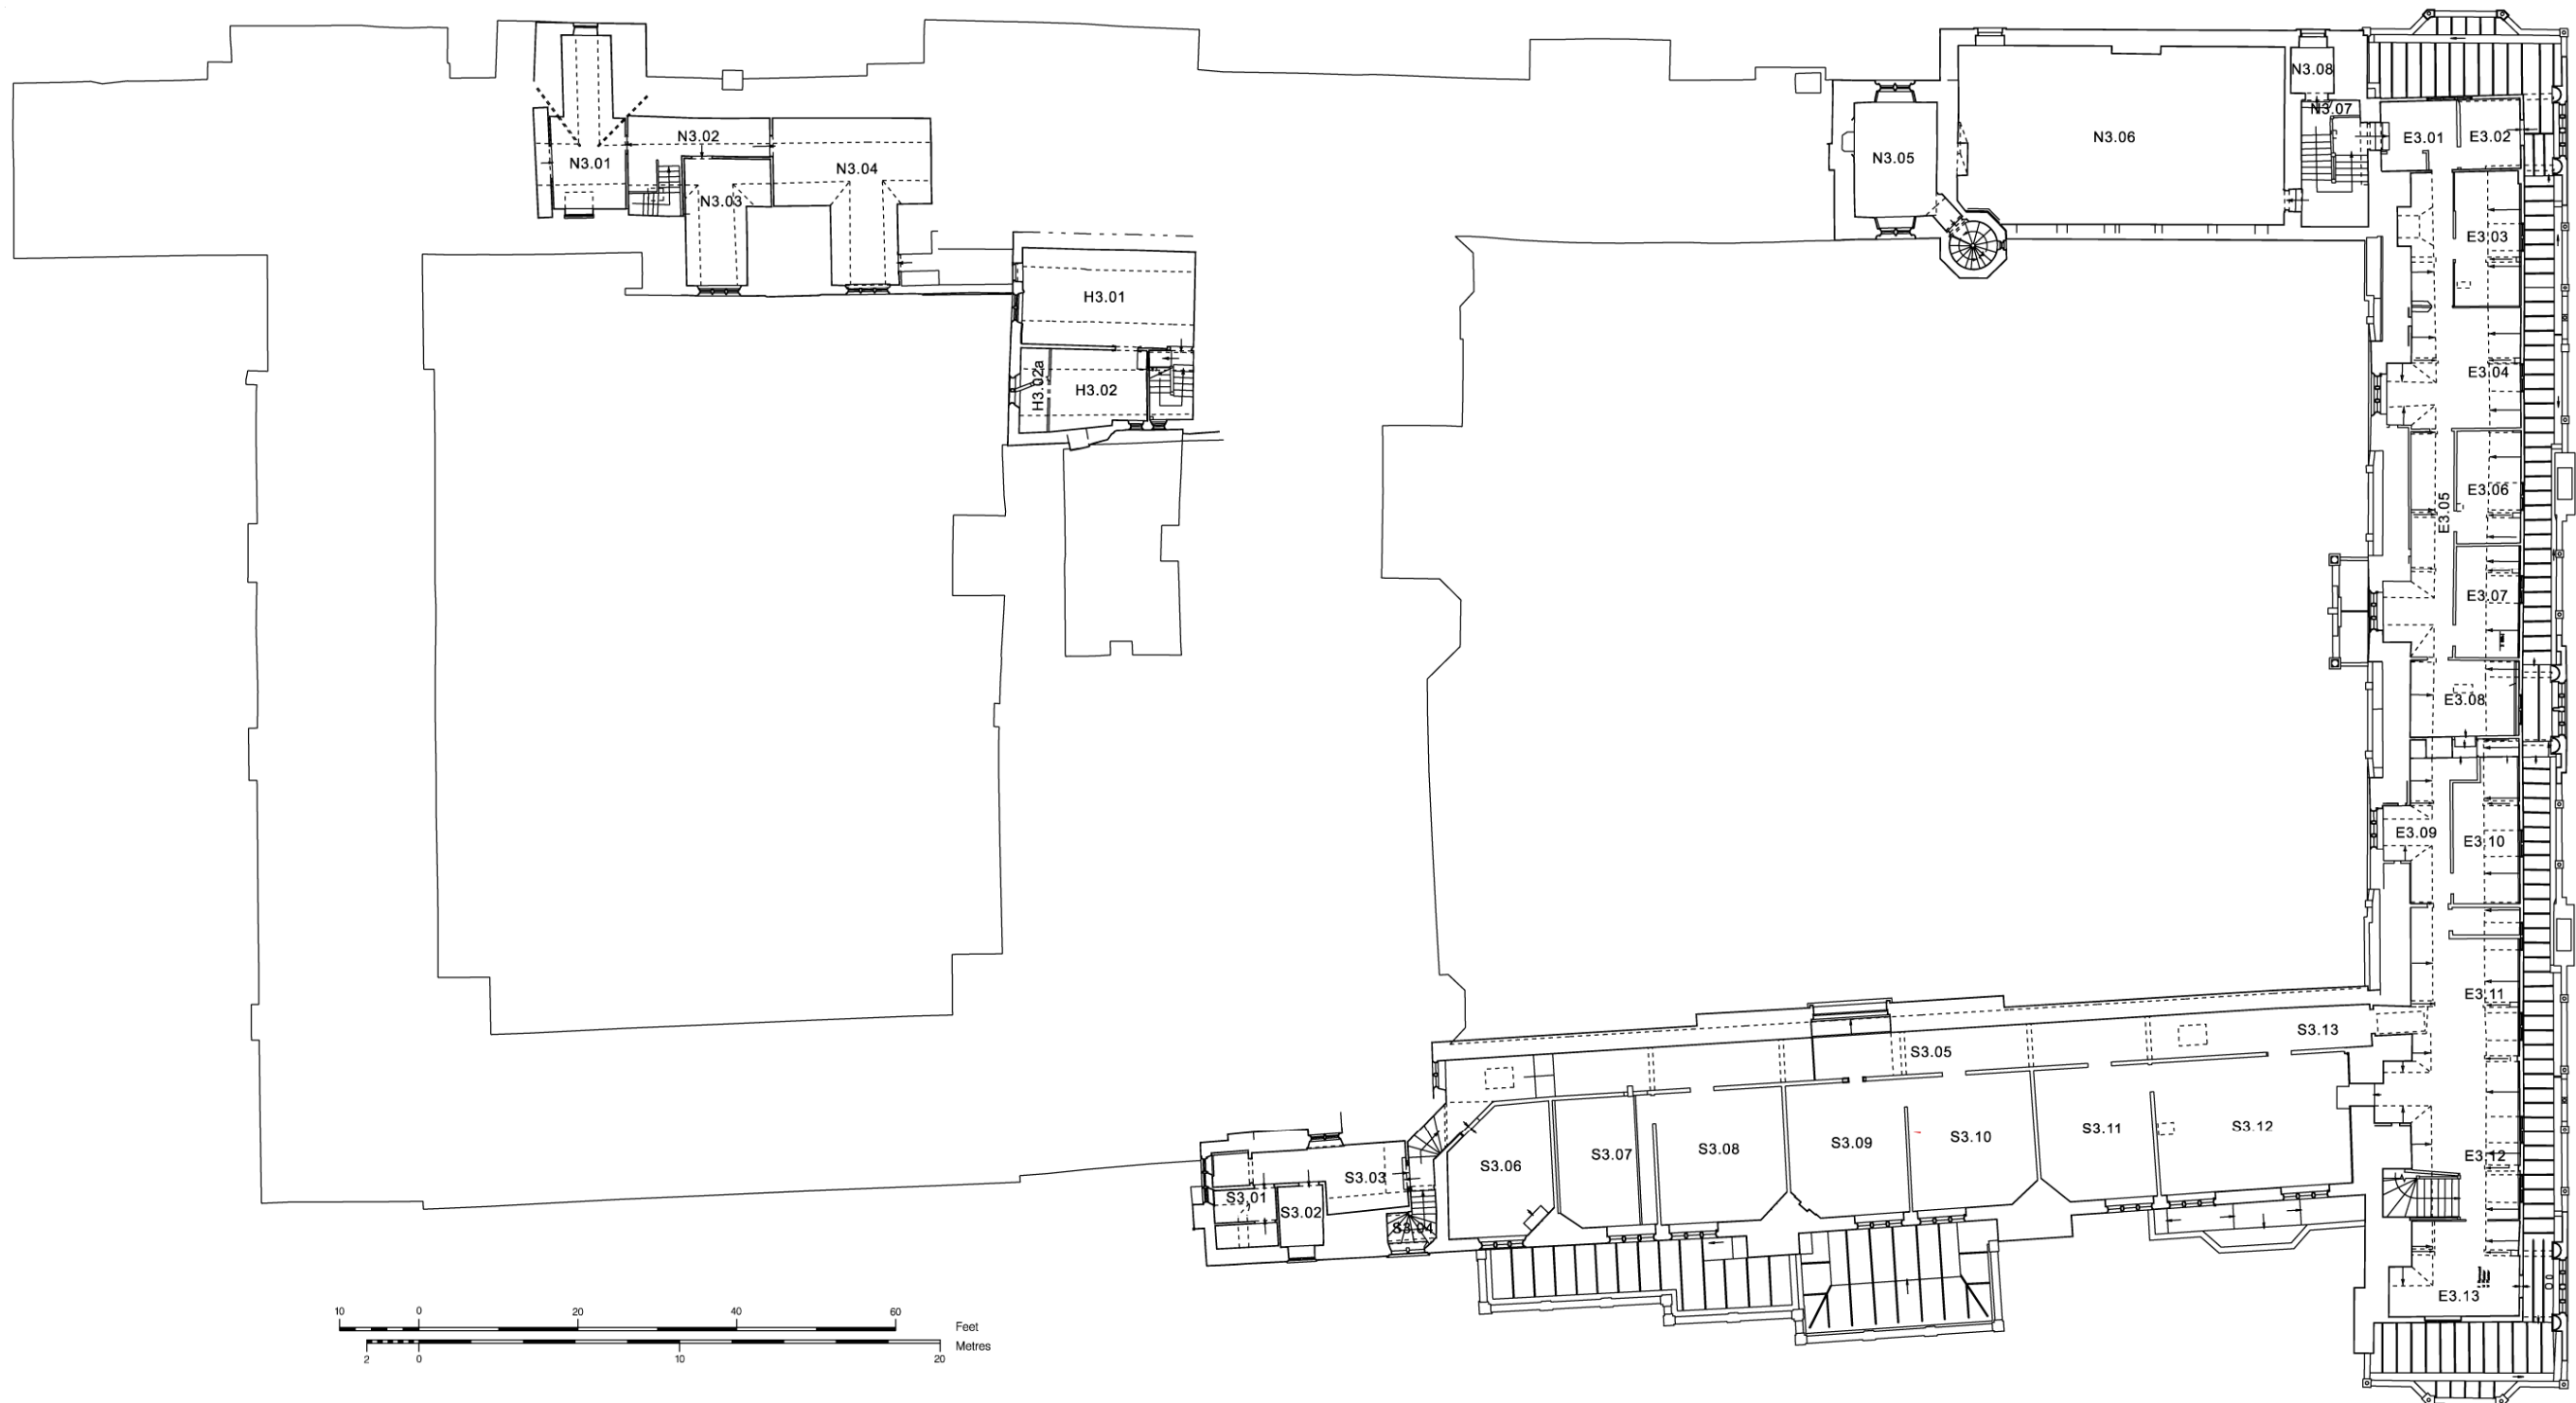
Second (attic) floor of Apethorpe Hall, showing room numbers. E - east range; H - hall range; N - north range; O - Orangery; S - south range; W - west range
